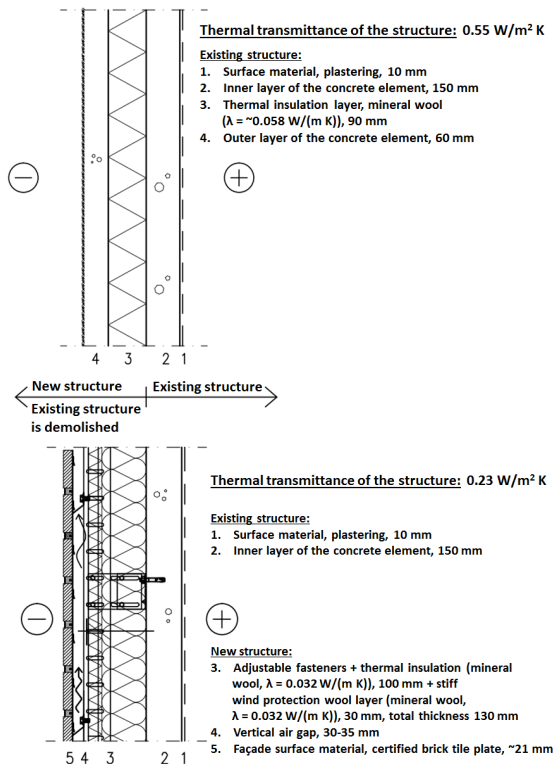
The structure details of original (above) and renovated (below) external walls, according to the selected renovation methods with the new and existing structure layers presented.
